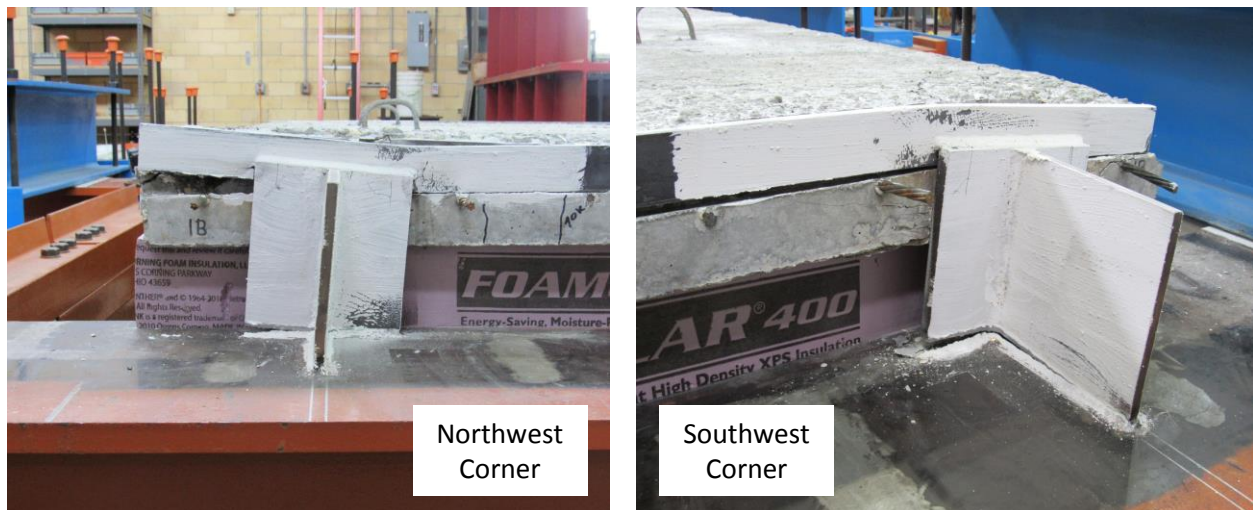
WT to Loading Beam Weld Rupture for PCP Detail B.1.MAX (Kintz 2017)
